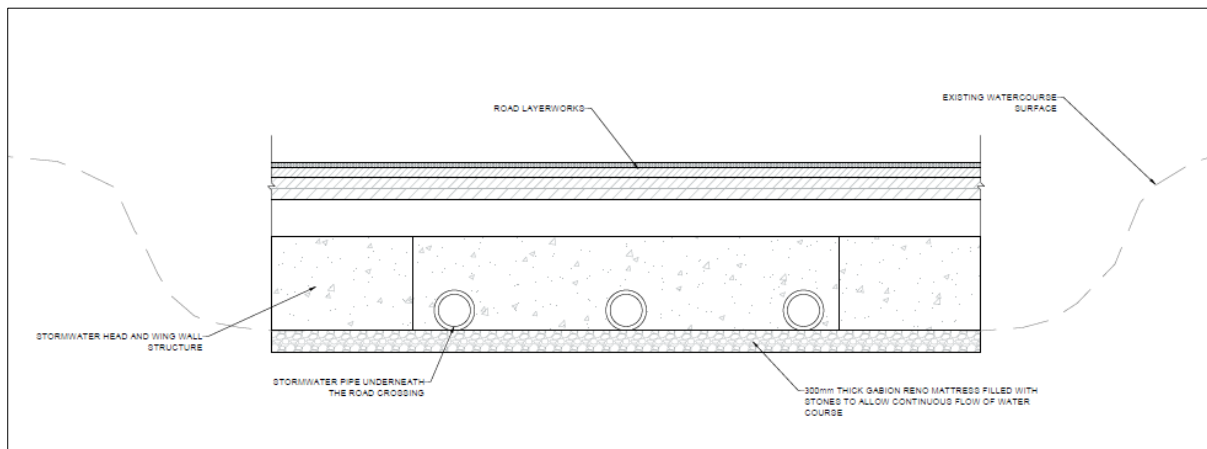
Typical detail of road stream crossing (Lyners, 2025).
